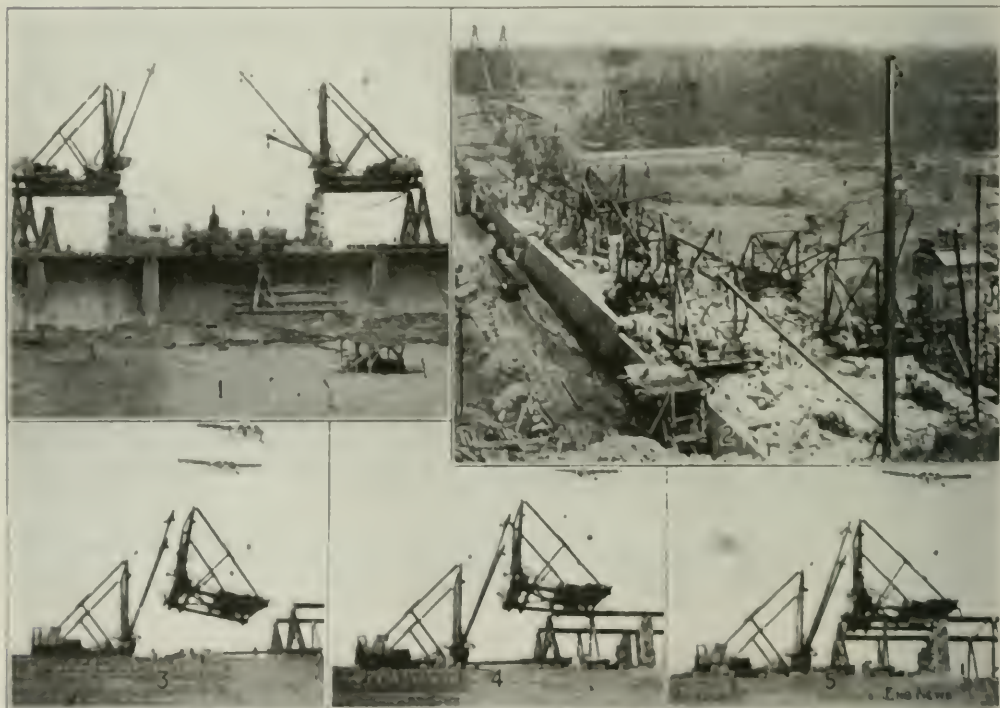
A. SHIFTING TRAVELERS FROM LAIDERS TO UPPER LAIDERS, KENSICO DAM
